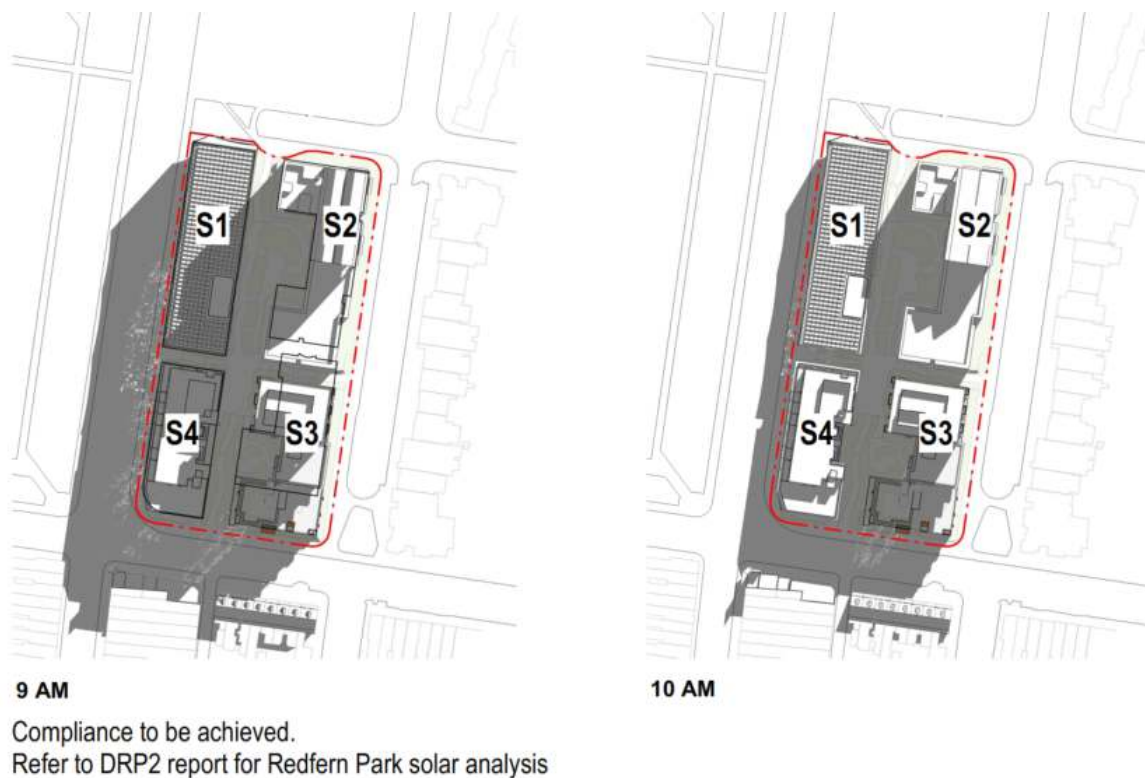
Excerpt of shadow diagram showing 9am-10am shadows of proposed buildings. Source: Hayball.
